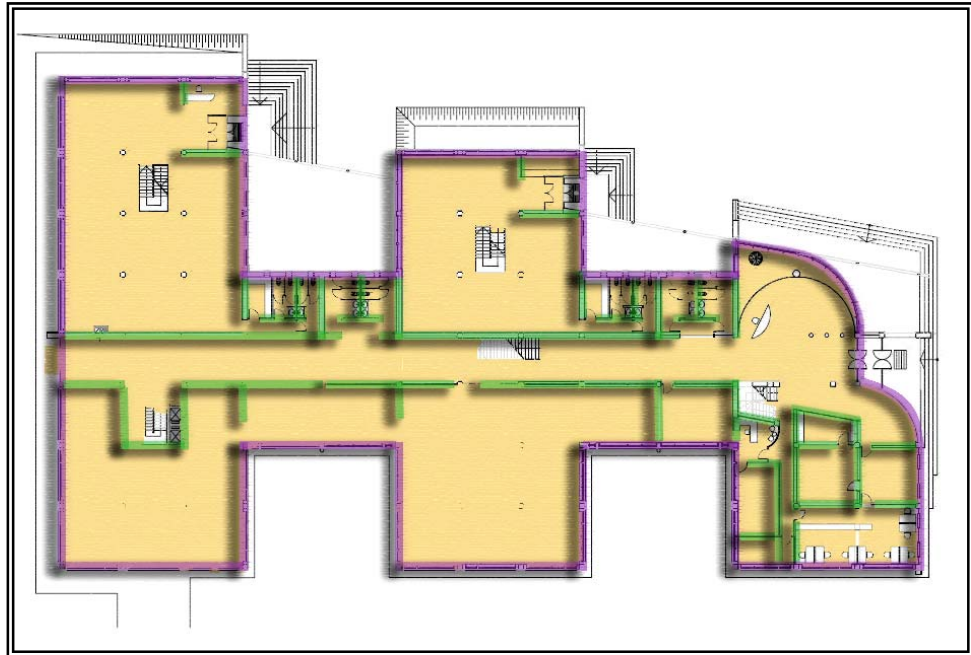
Adopted ground floor plan of METU Halıcı Software House.
